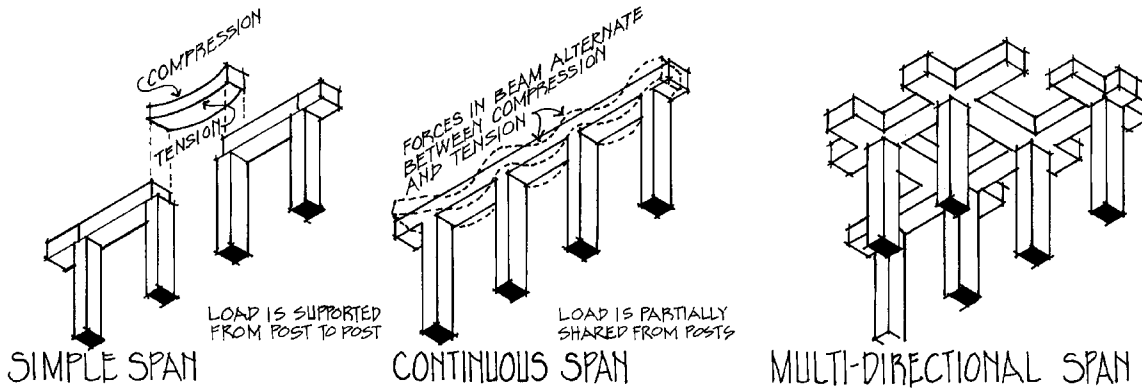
Post-and-beam systems can be constructed as simple spans or be integrally made into composite sections, thus increasing their structural characteristics.
